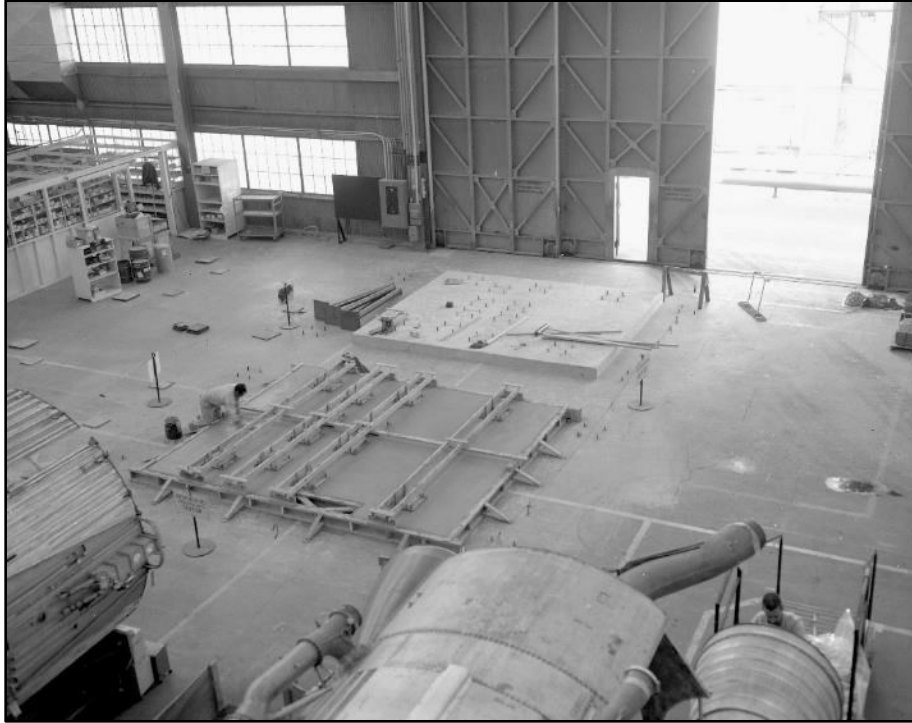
Aft Foundations Docks 1 and 2, Building 3 (March 22, 1961)
